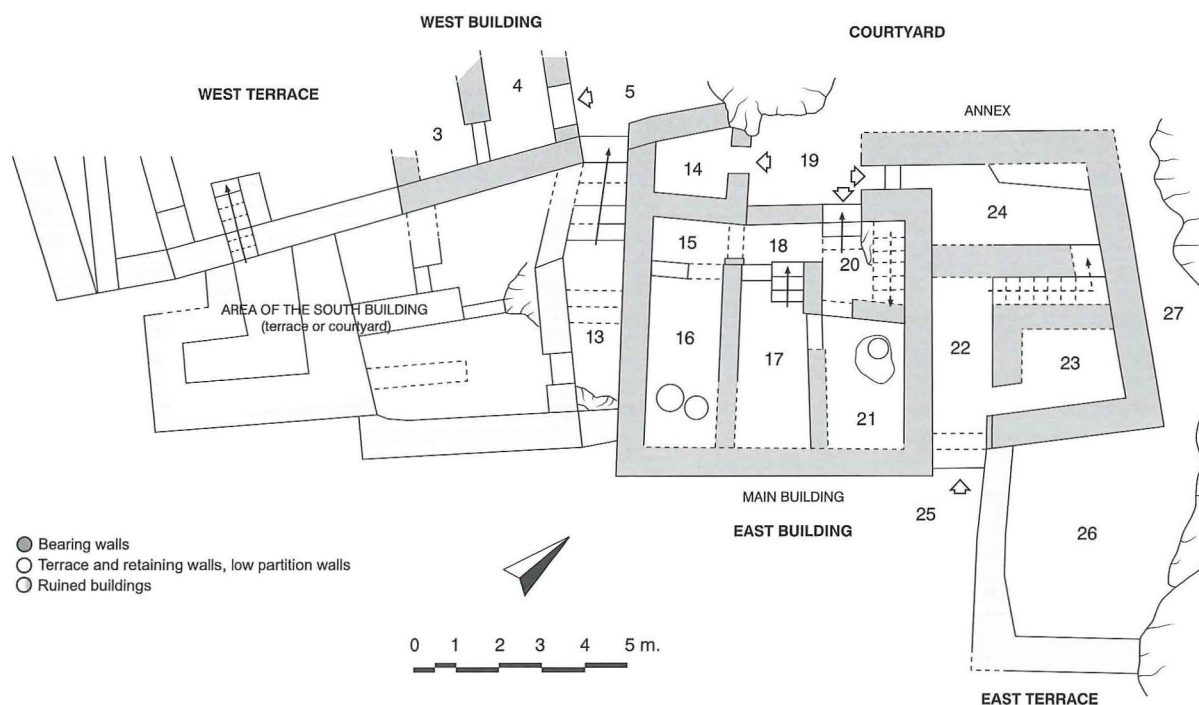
Sea Guard-House. The excavated section of the site in Period III. Ground plan.
